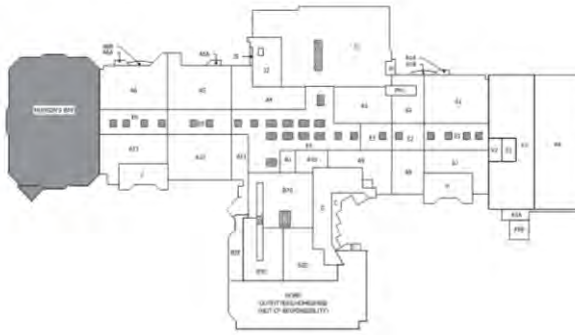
Roof plan showing Hudson's Bay roof at the south side of building.
